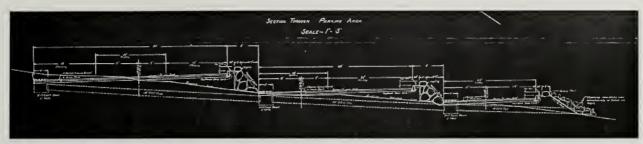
Cross-section of the tiered parking lot at the end of Schoodic Point Road on the Schoodic Peninsula, 1933. (U.S. Department of Agriculture, Bureau of Public Roads, Project 2A2, Sheet 2 of x, 1933-1934)
